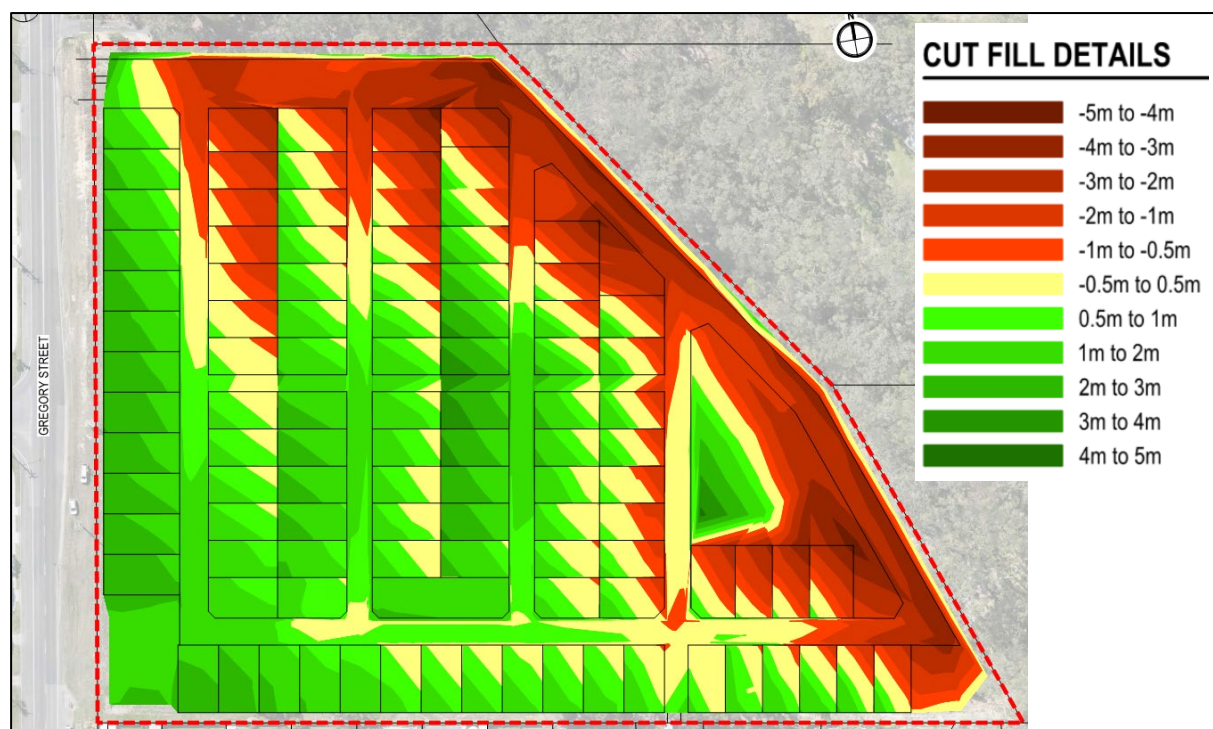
Earthworks Plan (Source: King + Campbell, 2025)
